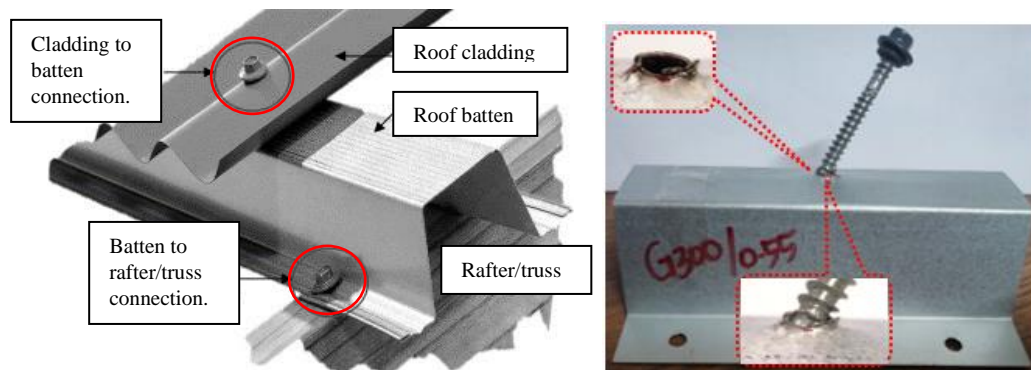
Typical CFS roof structures [27] and pull-out failure.
